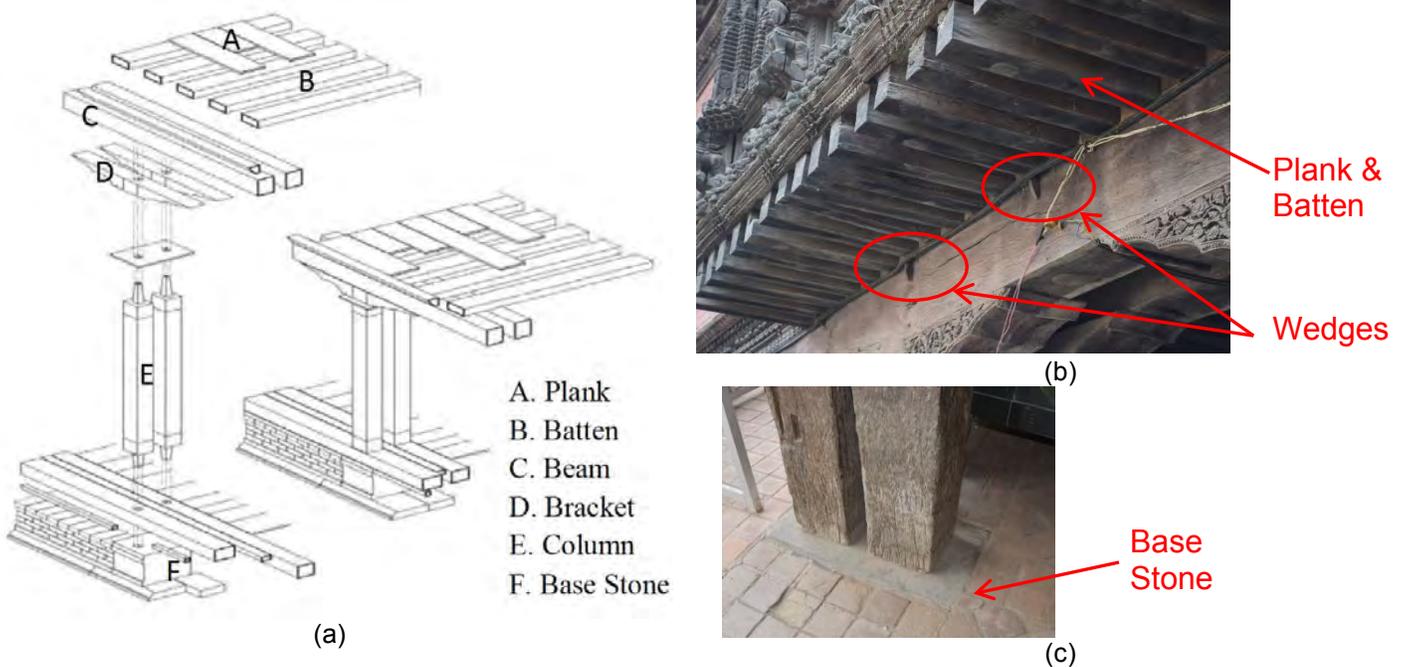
Typical framing and construction details for a wood-framed temple: (a) primary framing components (sources: Shakya, 2012, Bonapace et al., 2013), (b) examples of planks, battens, and wedges, and (c) connection of wood column on base stone (photos and annotations: Suraj Shrestha).
